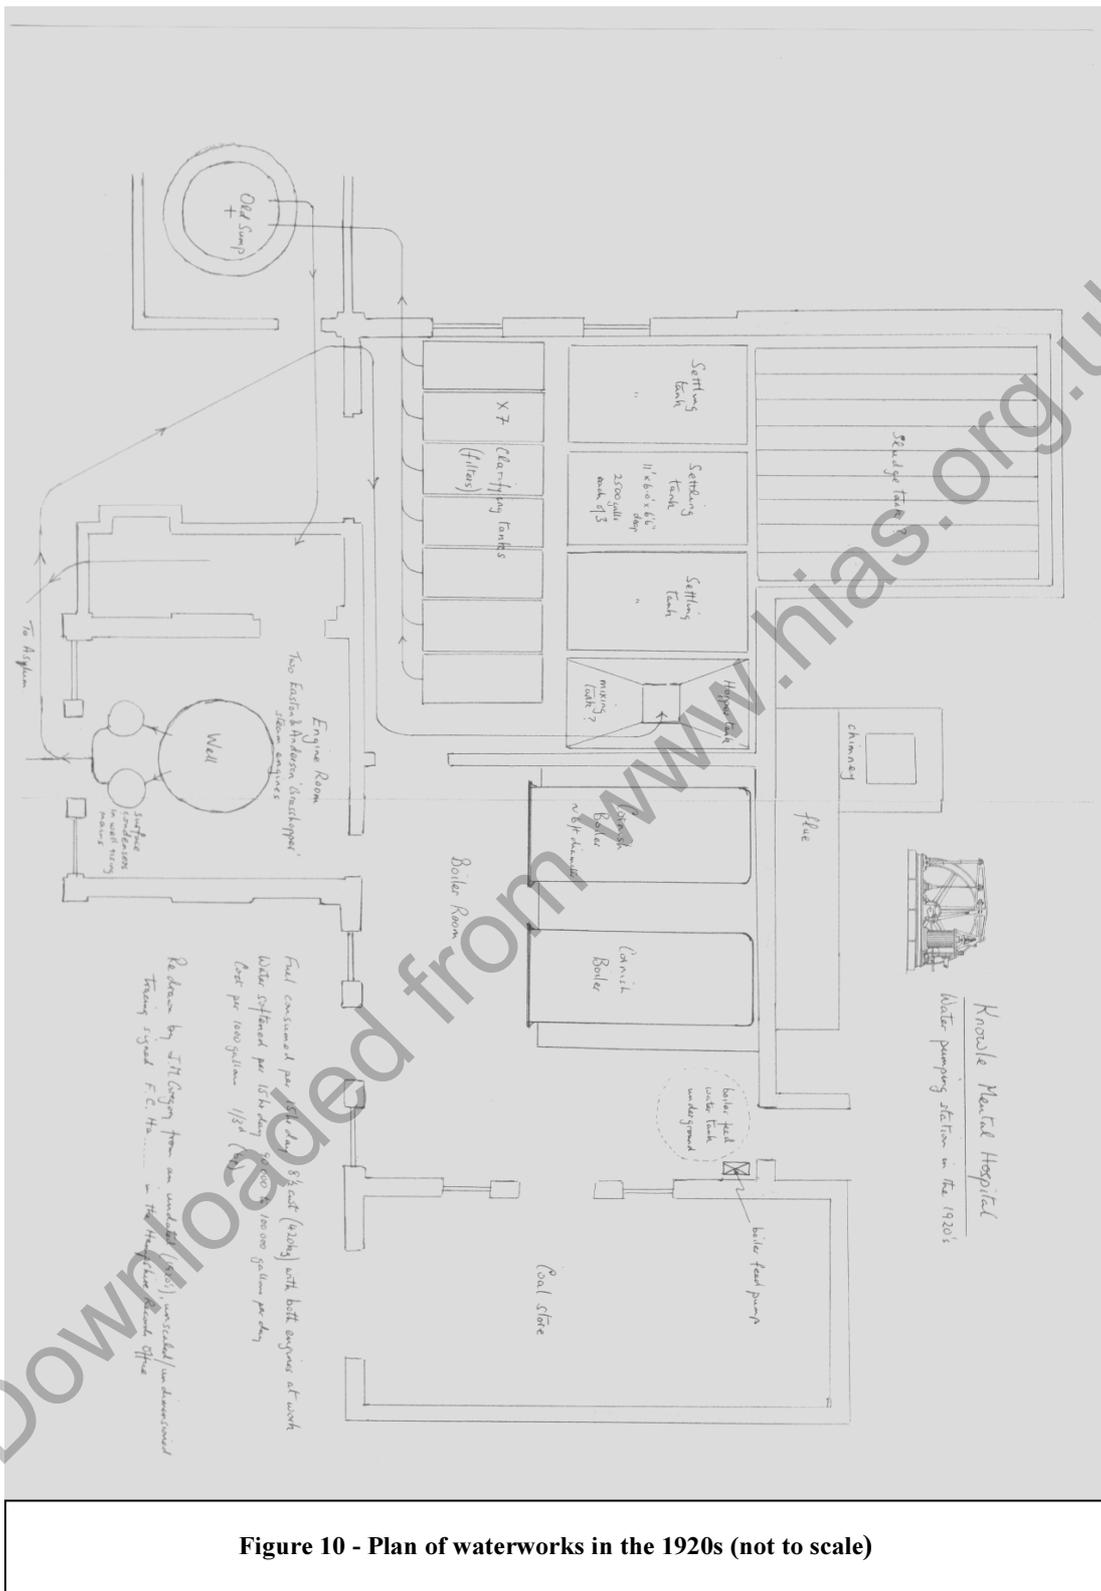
Plan of waterworks in the 1920s (not to scale)
